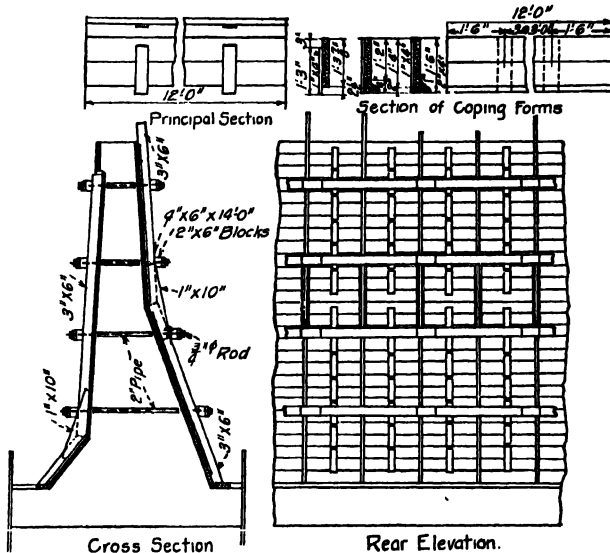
Sectional forms for retaining wall—C. B. &amp; Q. Ry.
